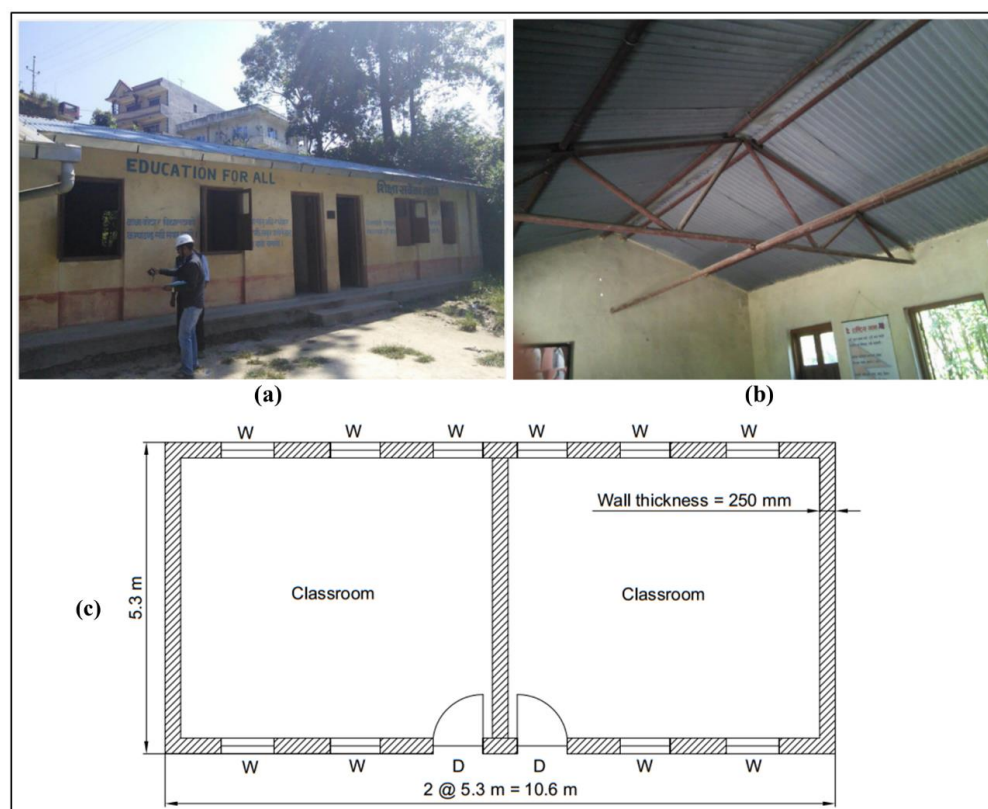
Construction characteristics of the case study URM school building: (a) outside longitudinal view, (b) inside view showing the short gable wall and light steel roof structure, and (c) building plan with dimensions.
